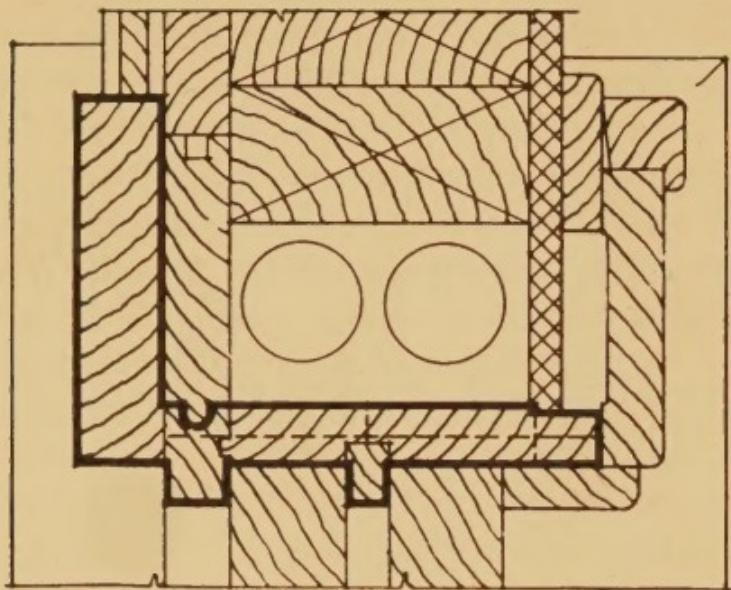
Standard wall board for inside wall finish. Standard stop moulding used for furring inside trim.
